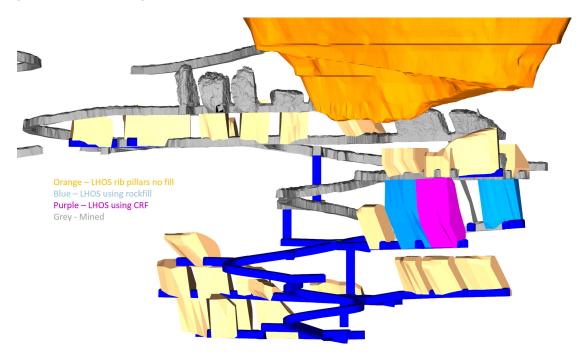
Isometric View of Caloma One Pit and Stope Shapes
